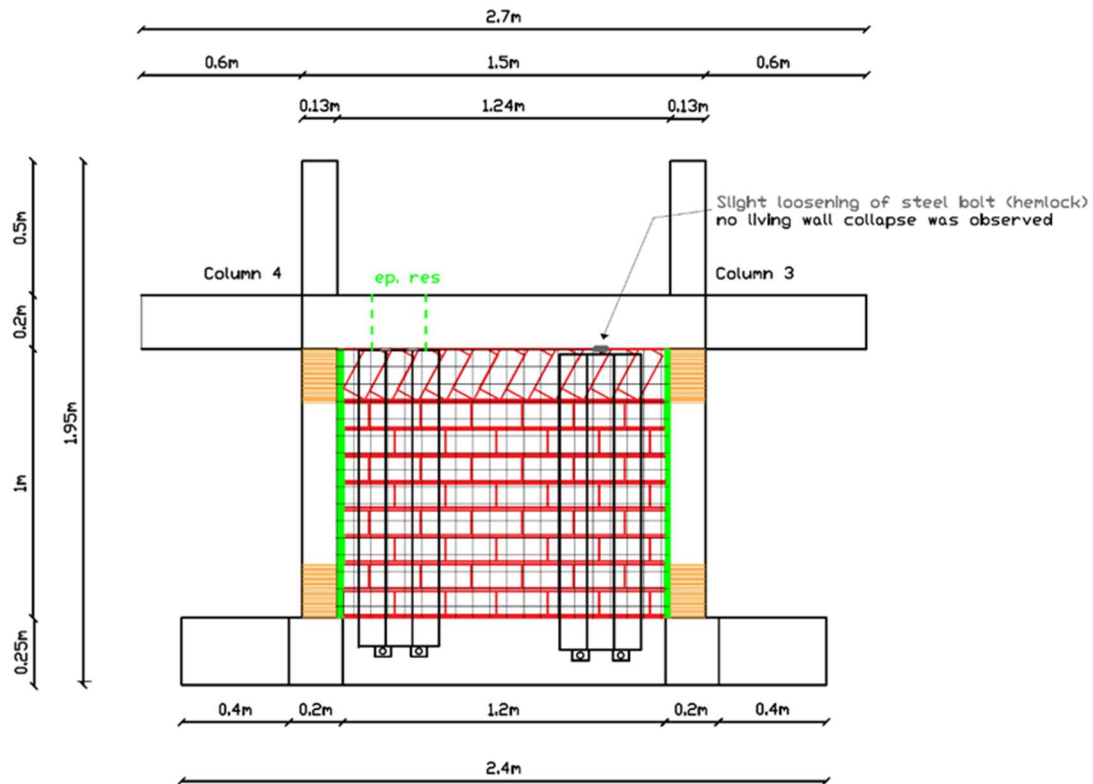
Observed damage after 1.3g(2) test: Steel rod (hemlock) slight loosening at the top of living wall LW3-4R allowing micromovements for low direct horizontal loads (frequent wind) but no living wall collapse was observed.
